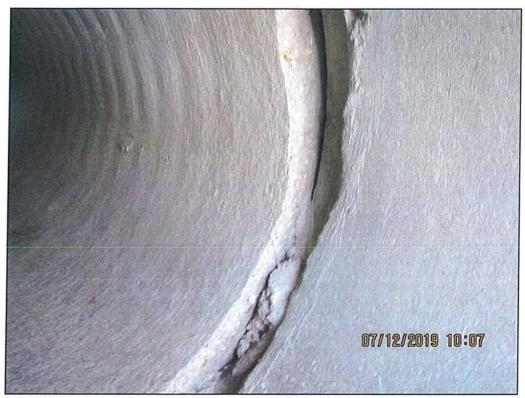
Service spillway. Upstream side. Note typical gaps in construction joint.
